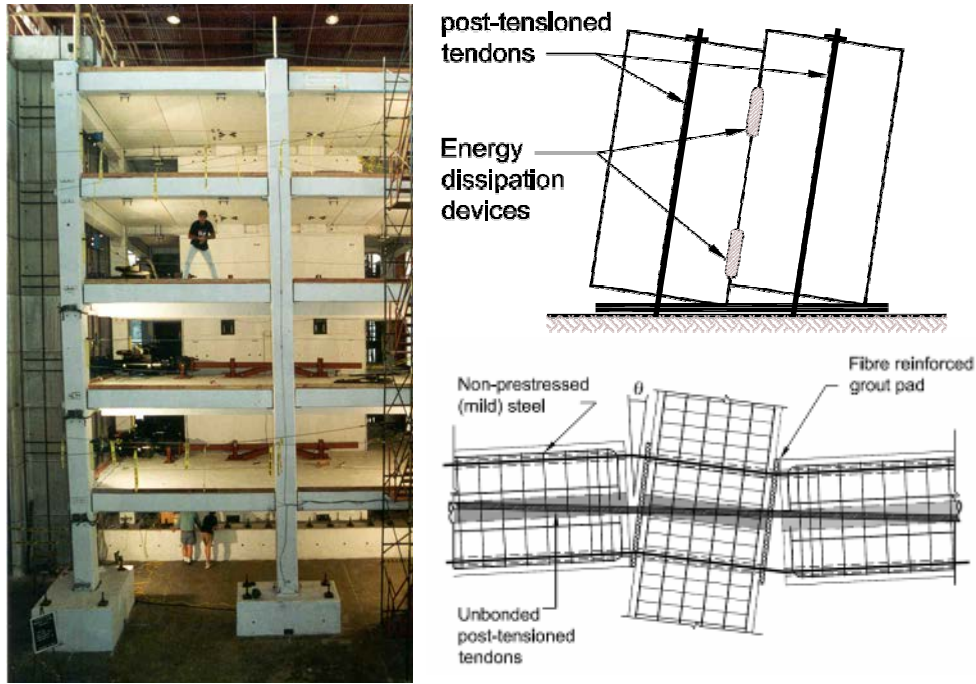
Left: Five-Storey PRESSS Building tested at University of California, San Diego (Priestley et al., 1999); Right: Jointed precast “hybrid” frame and wall systems (fib, 2003; NZS3101:2006)
